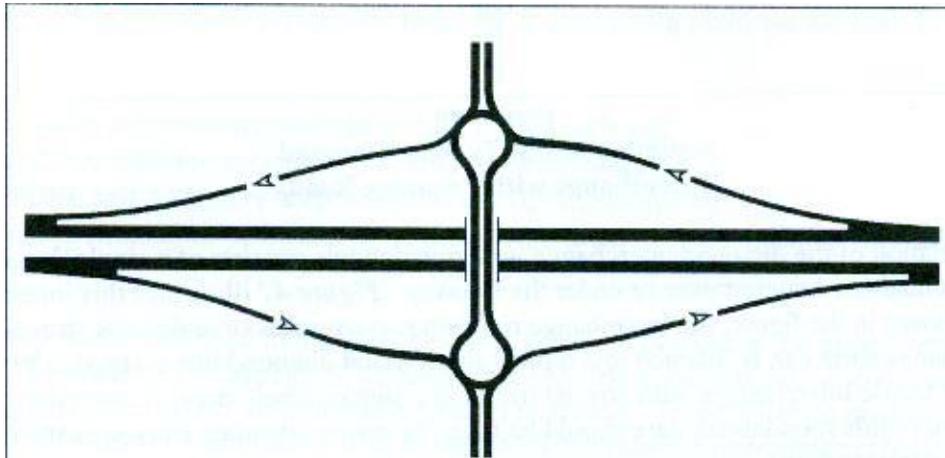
Typical Diamond Interchange with Roundabouts at Ramp Terminal Intersections
